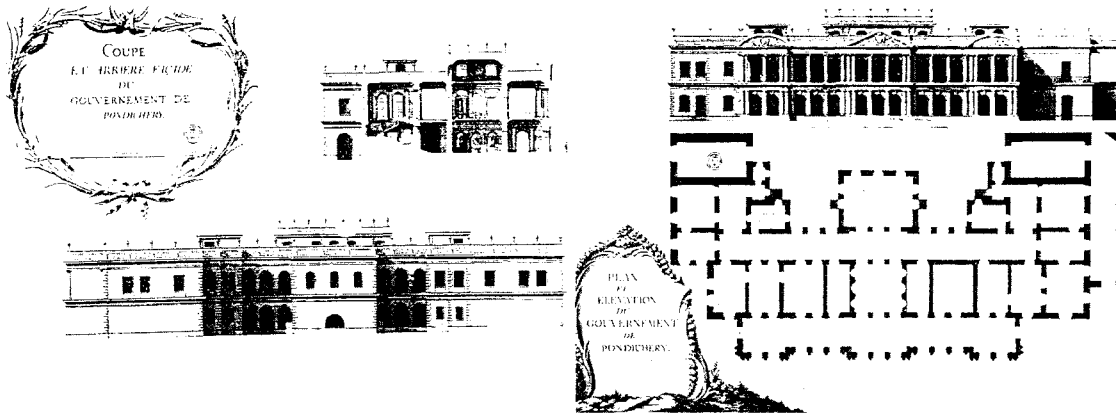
Plan and Front Elevation of Government House, 1752, Dubleix, Pondichery.
